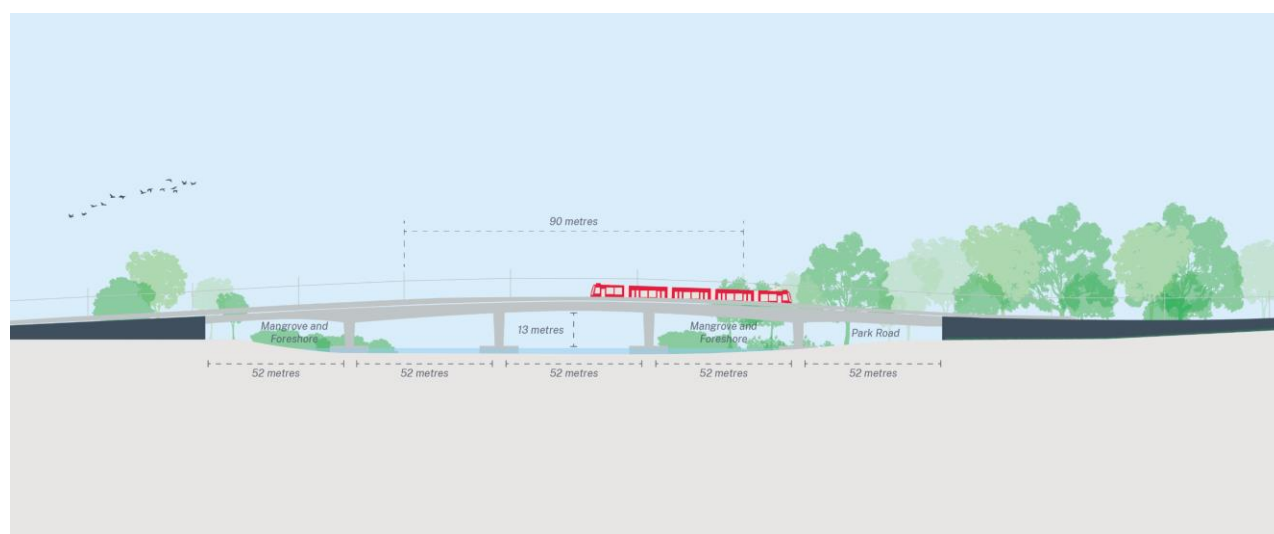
Indicative elevation of bridge between Camellia and Rydalmere (viewed from the east)
